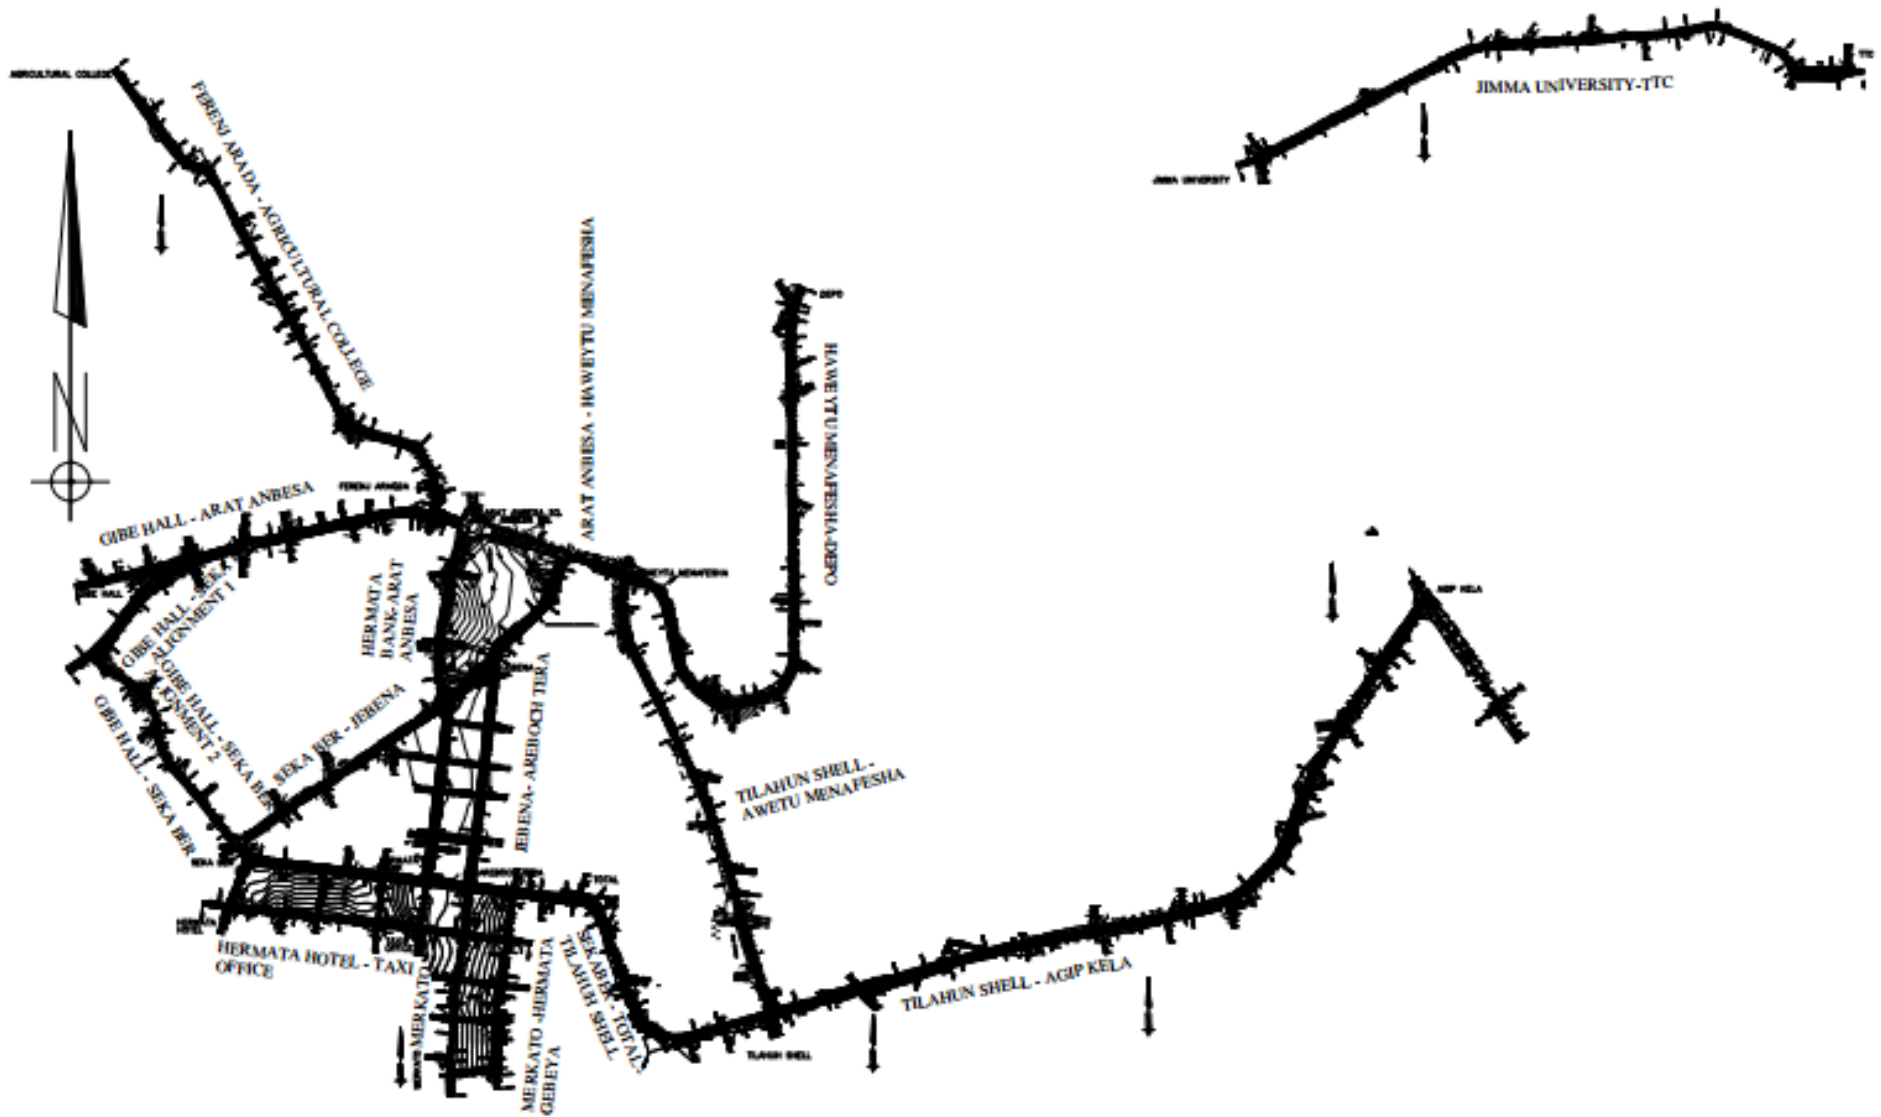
Plan of the All Routes in Jimma Town Asphalt Project
